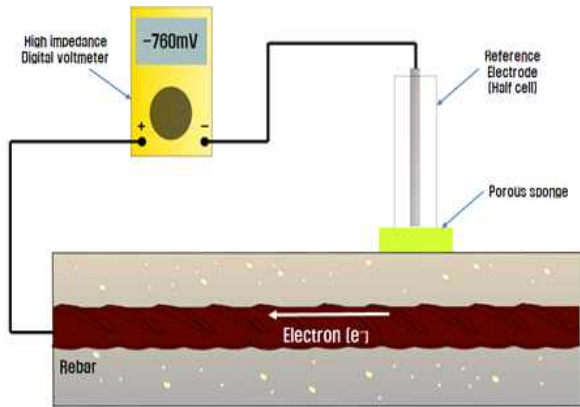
Schematic view on corrosion potential measurement of reinforced steel in concrete.
